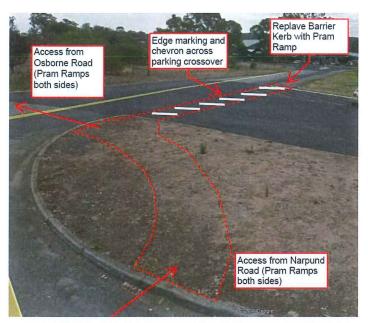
Narpund Road path upgrades at Osbourne Road intersection
